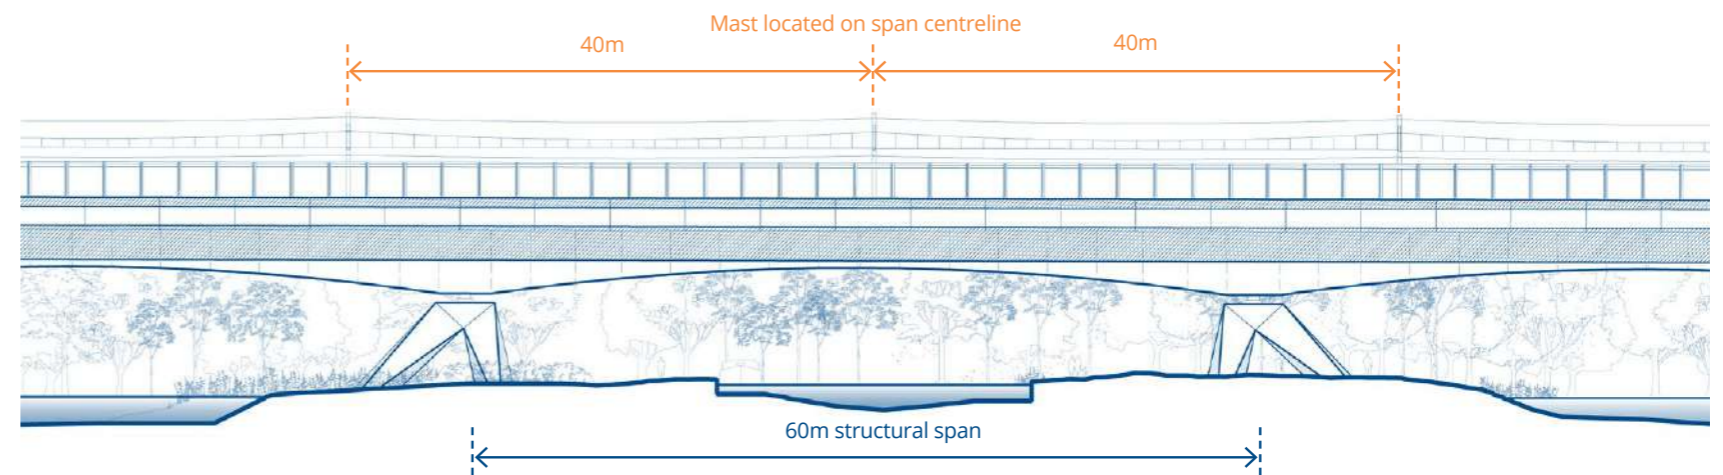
\_ OHLE setting out - Typical fixed buttress span
